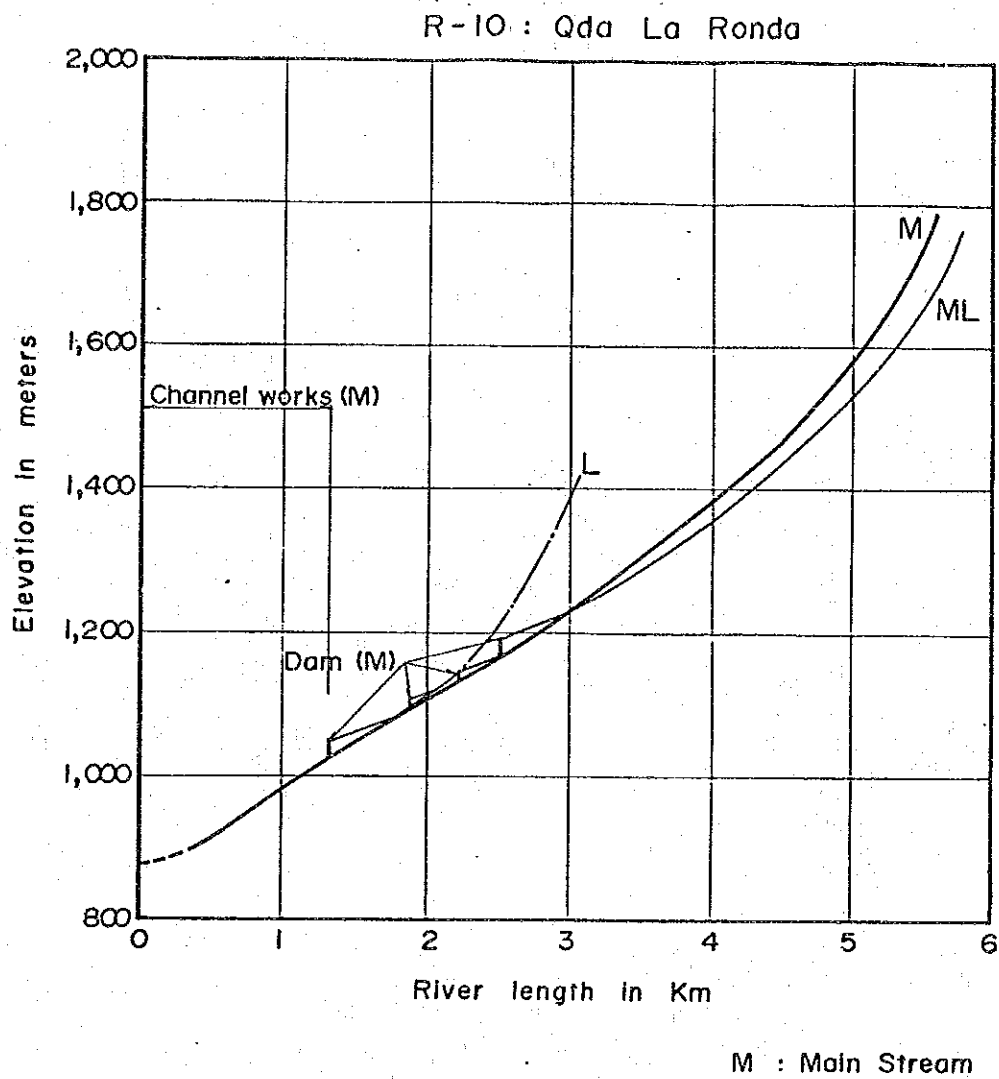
Structural Plan on Profile of Qda La Ronda (R10)
